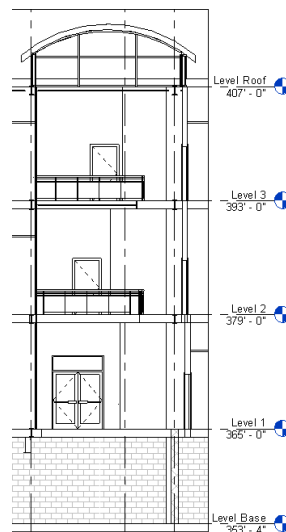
Atrium Section with Floor-to-Floor Dimensions
